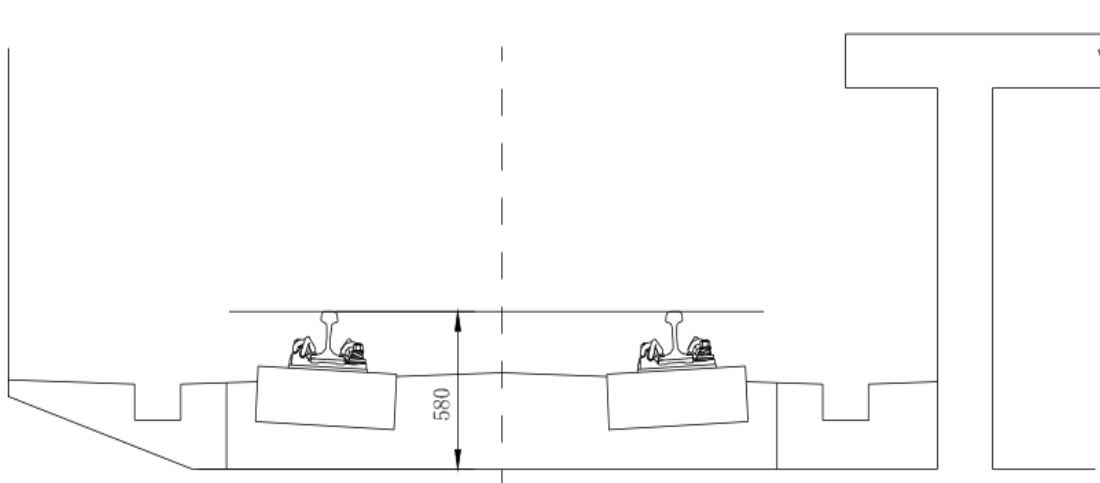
Reinforced Concrete Track Bed with Short Sleeper for Underground Line
